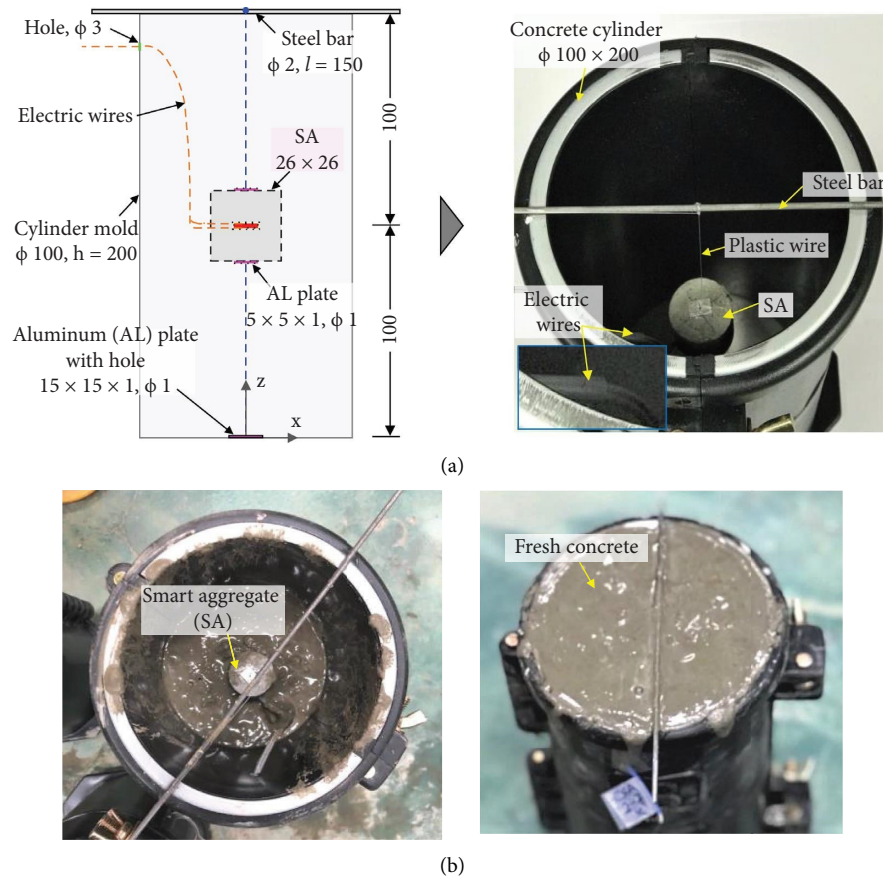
Fabrication of SA-embedded concrete cylinder. (a) Localization of SA in cylinder specimen (dimension in mm). (b) Concrete casting.
